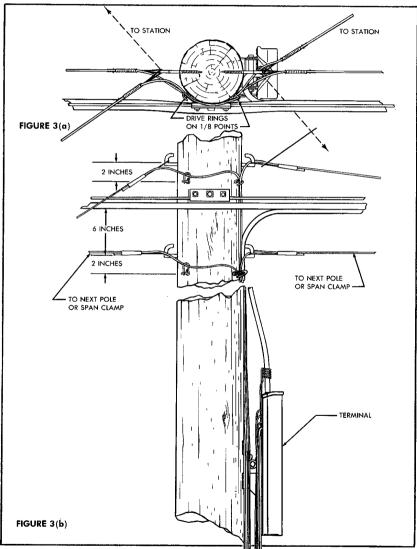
Terminal Mounted On Face Or Back Of Pole
